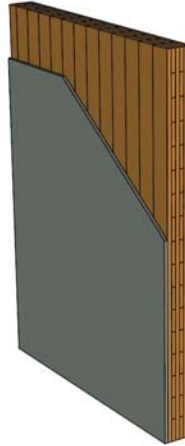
This is an example of an inner wall containing five layers of massive wood and one gypsum board. [13]
